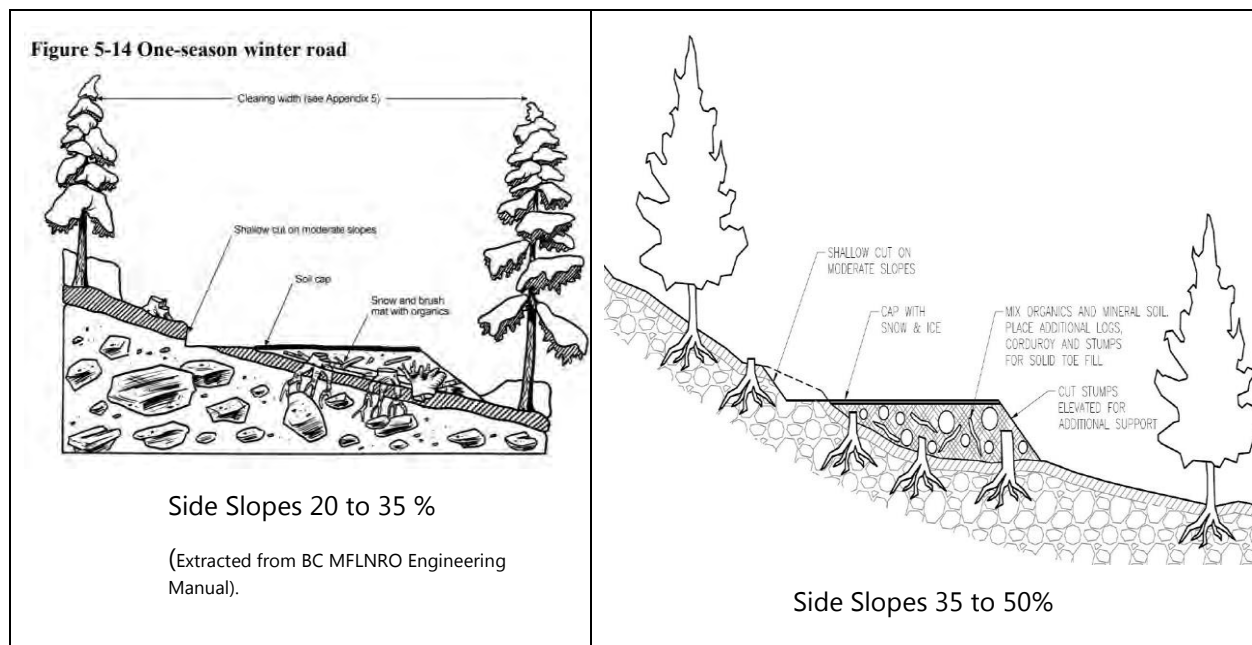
NON-TYPICAL WINTER ROAD TYPICAL SECTION
